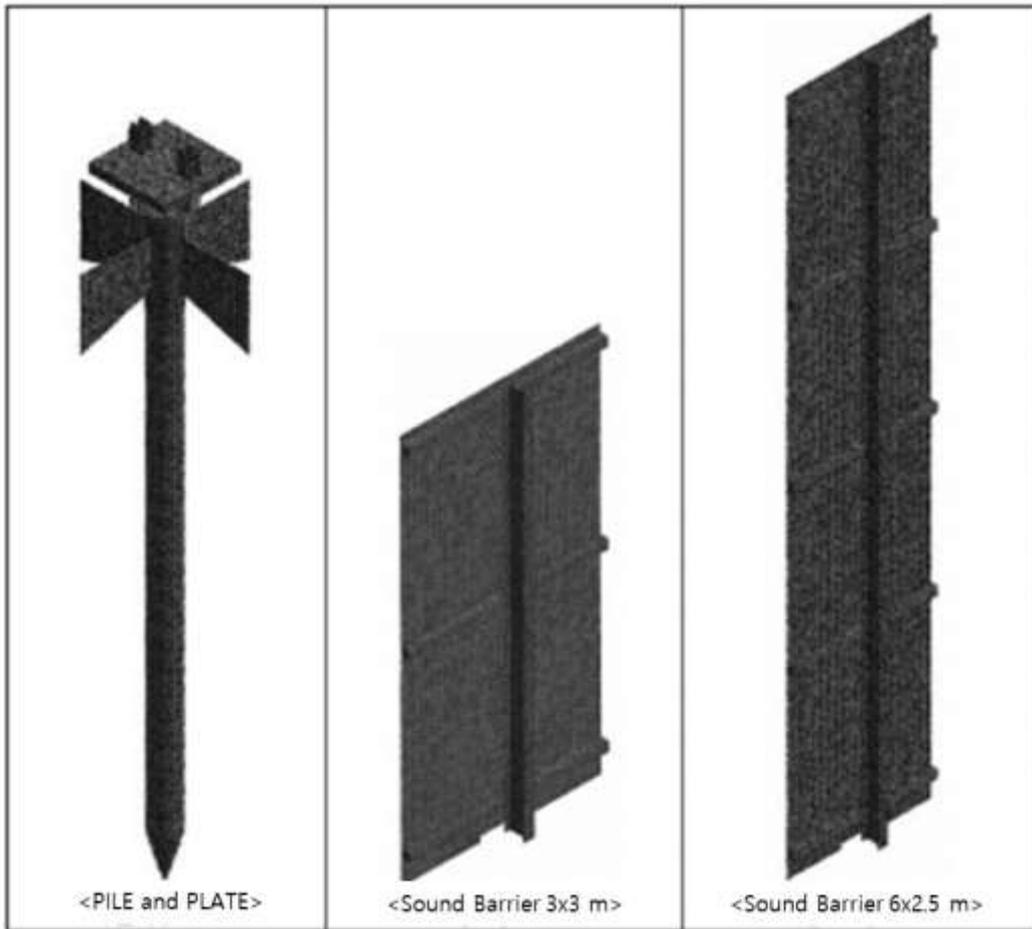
3-D modeling assembling pile plate, H-beam and sound barrier
